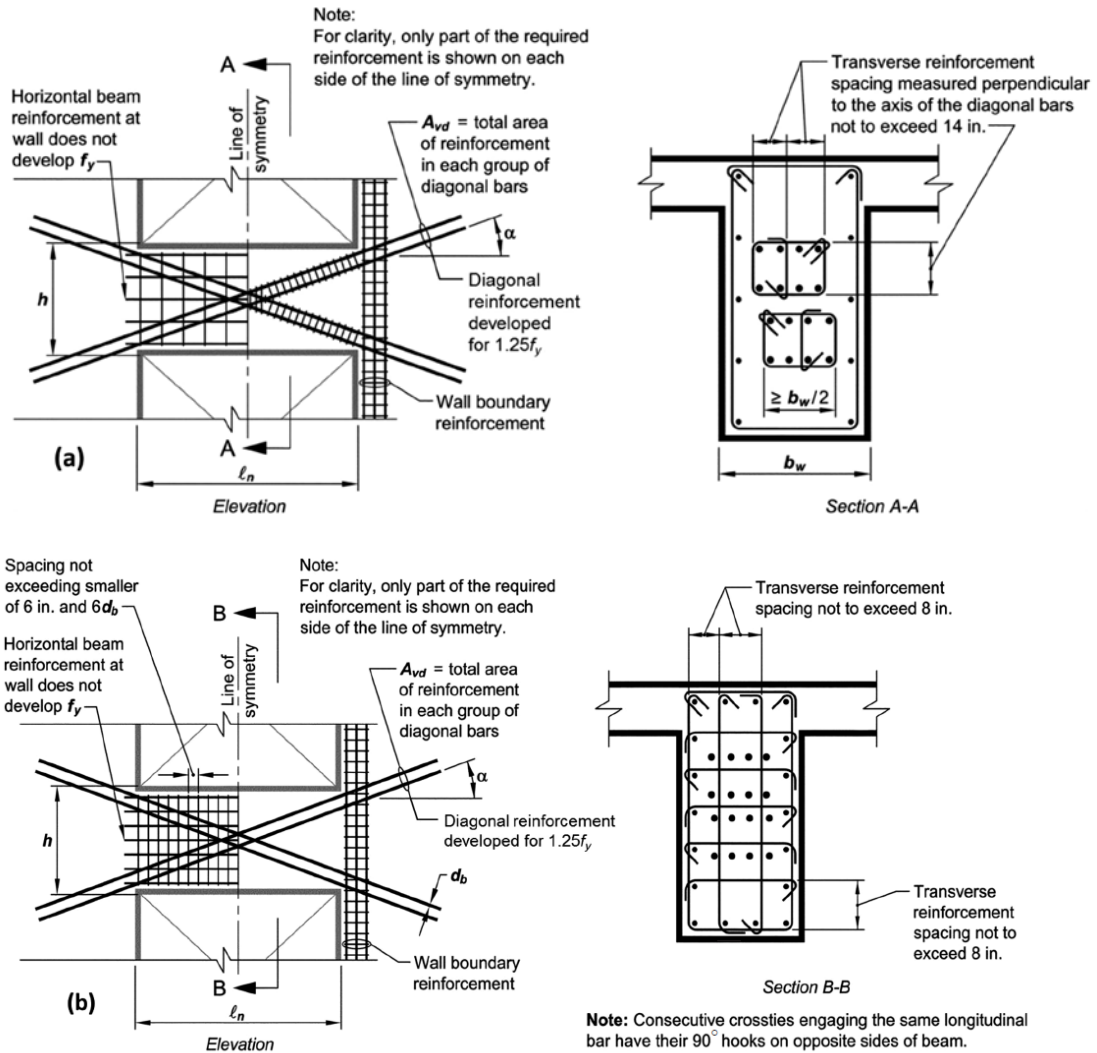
Coupling beams details with diagonally reinforcement (ACI 318-14)
